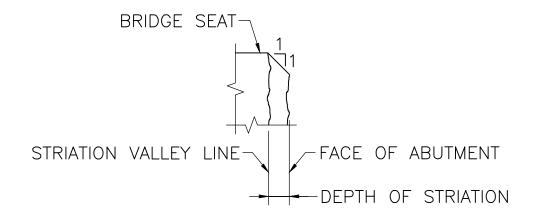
DETAIL AT TOP OF WINGWALL STRIATION DETAILS
